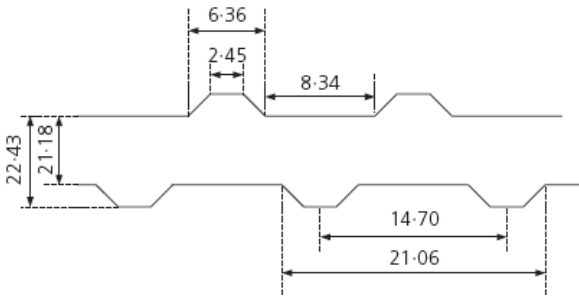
Shape and Dimension of a D22 Deformed Steel Bar (unit : mm)
